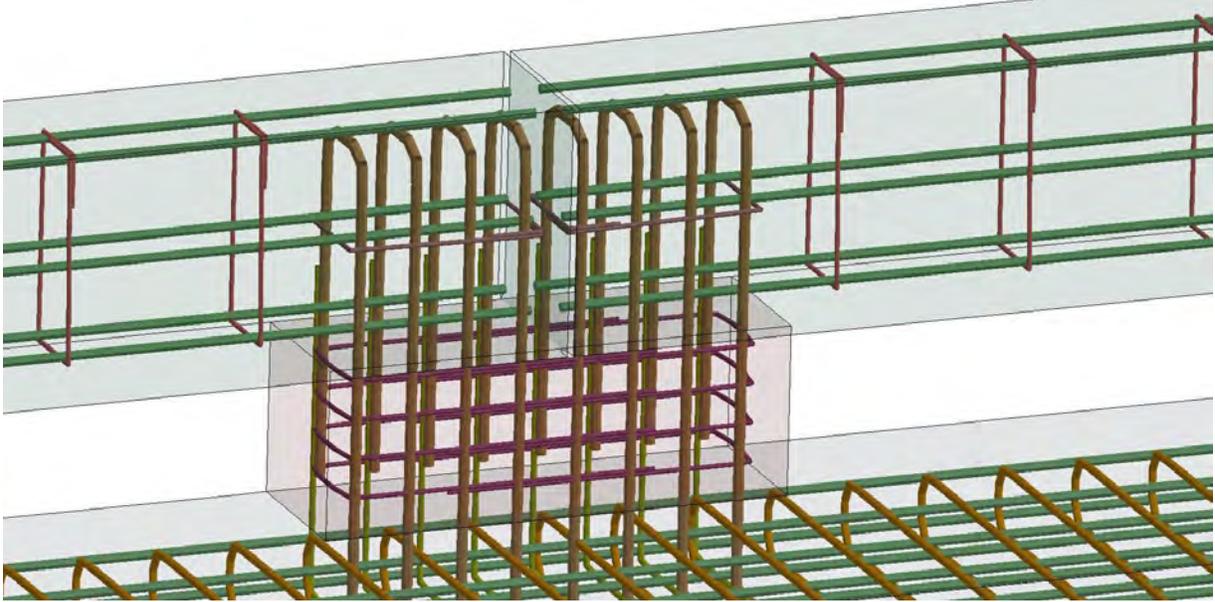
Detailed view of the steel reinforcement bars (concrete is transparent).
